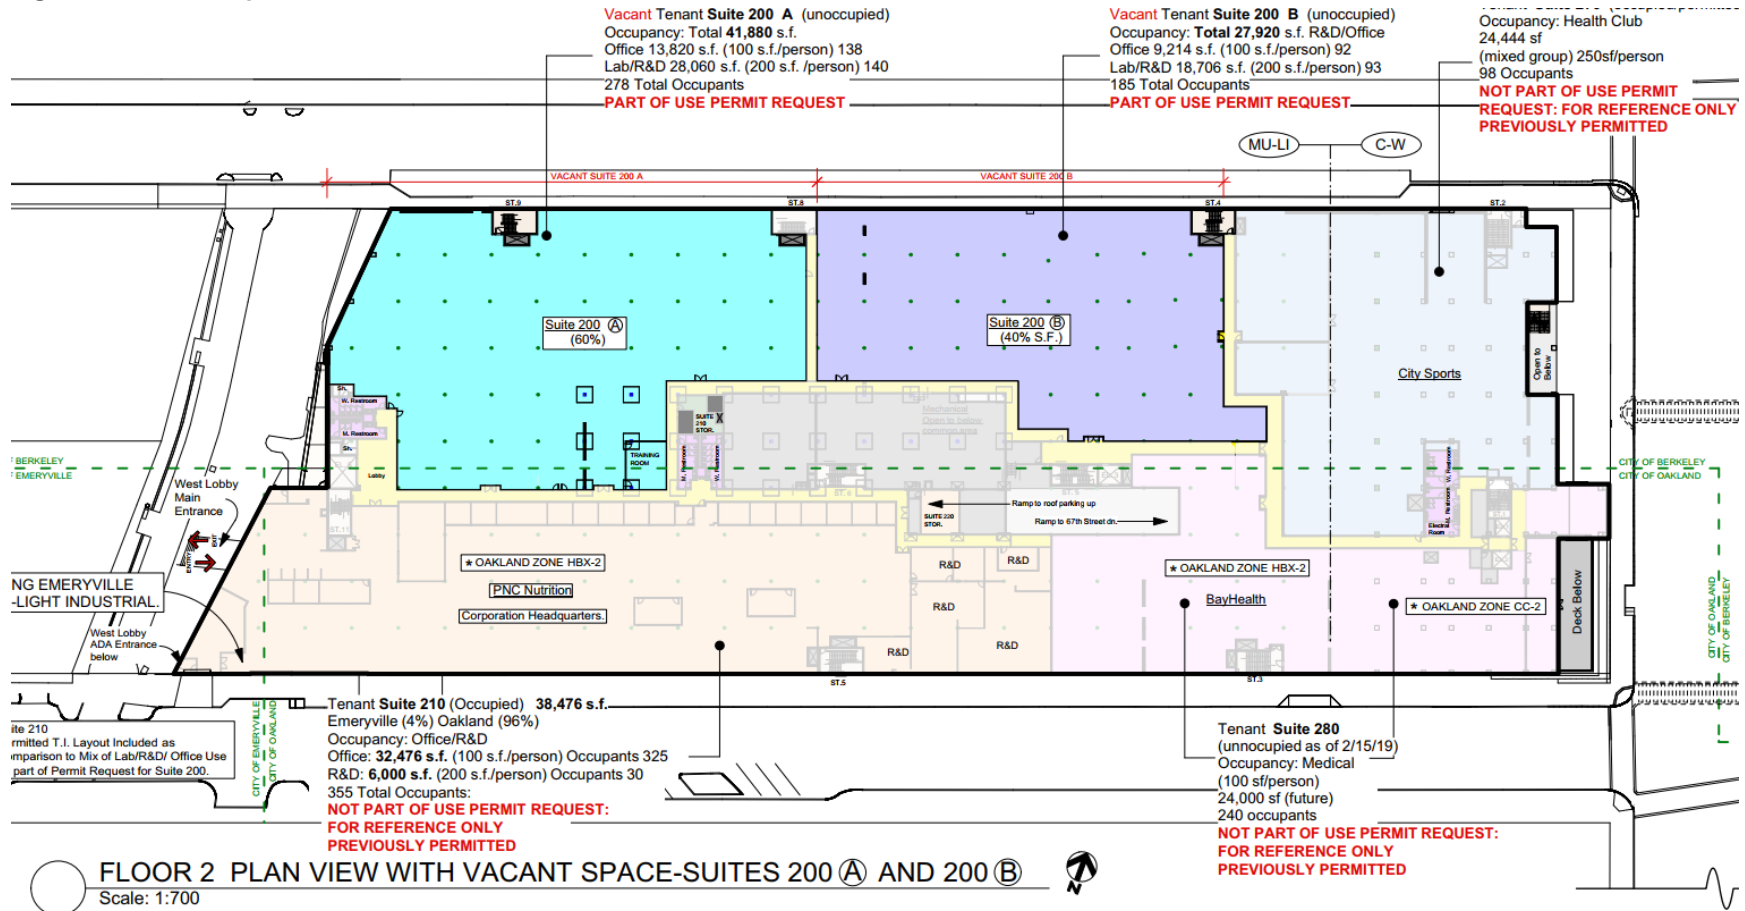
Proposed Second Floor Suite 200 Floor Plan
